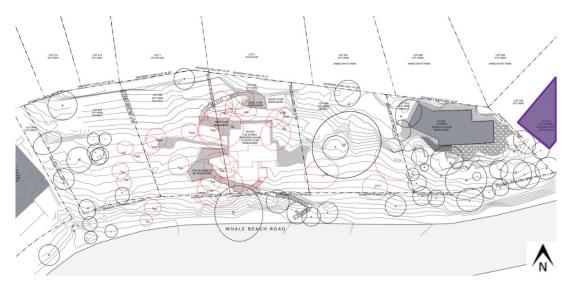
Demolition plan with proposed areas of demolition indicated in red, and existing heritage item Cox House (item no. 2270014) indicated in purple, Extract from Site Plan Existing & Demolition Plan (Source: Drawing No. 0101, Rev. A)
